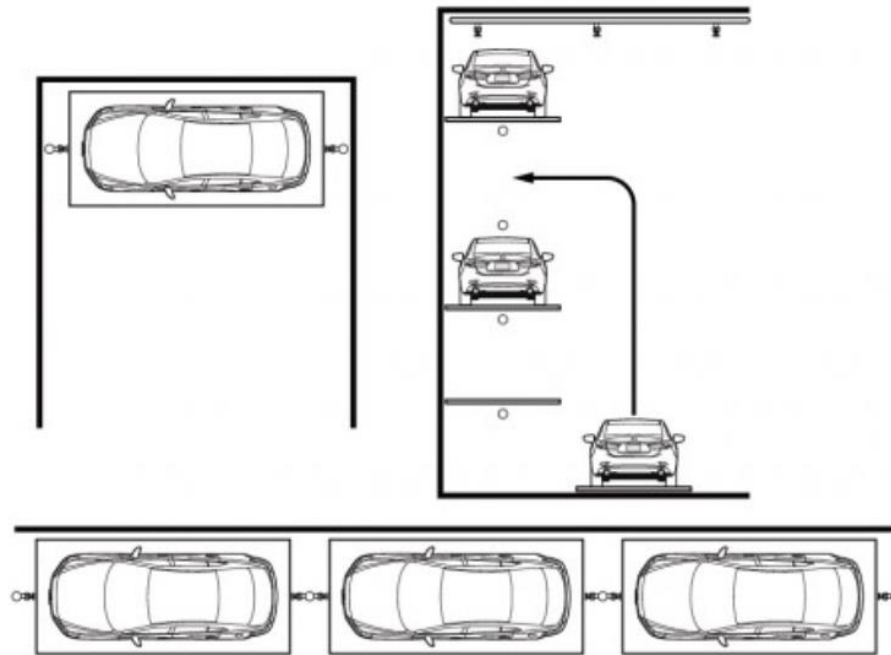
Typical sprinkler arrangement for single or multiple nose to tail AVPS (AS 2118.1:2017, 2017)
